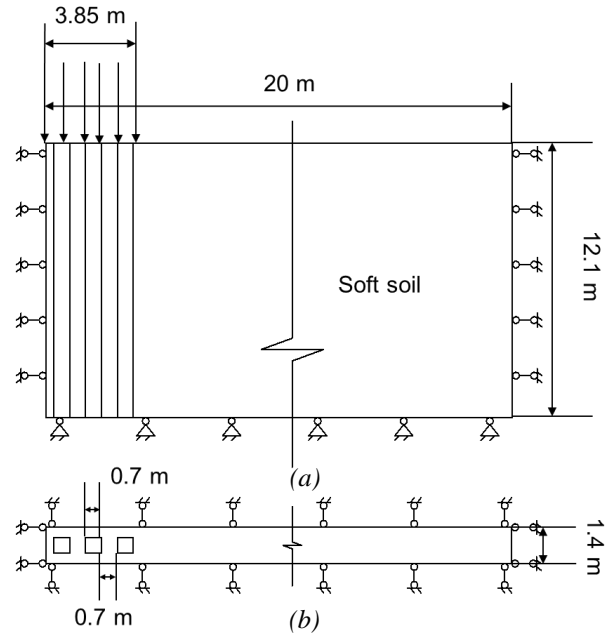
Layout of the reinforced columns: (a) Cross-section; (b) Plan view.
